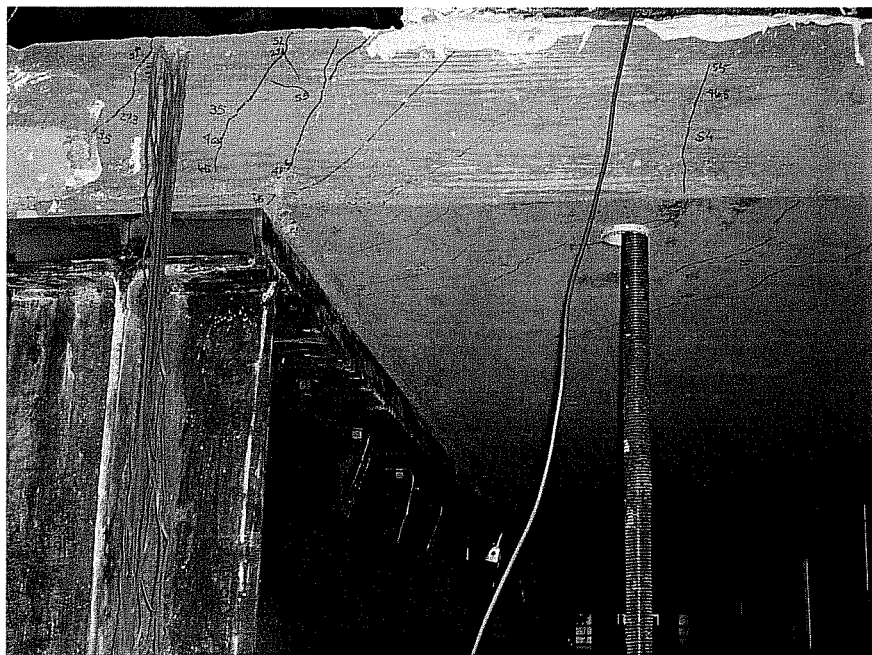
Failure of Overhang Test Area 1, side view, facing north
